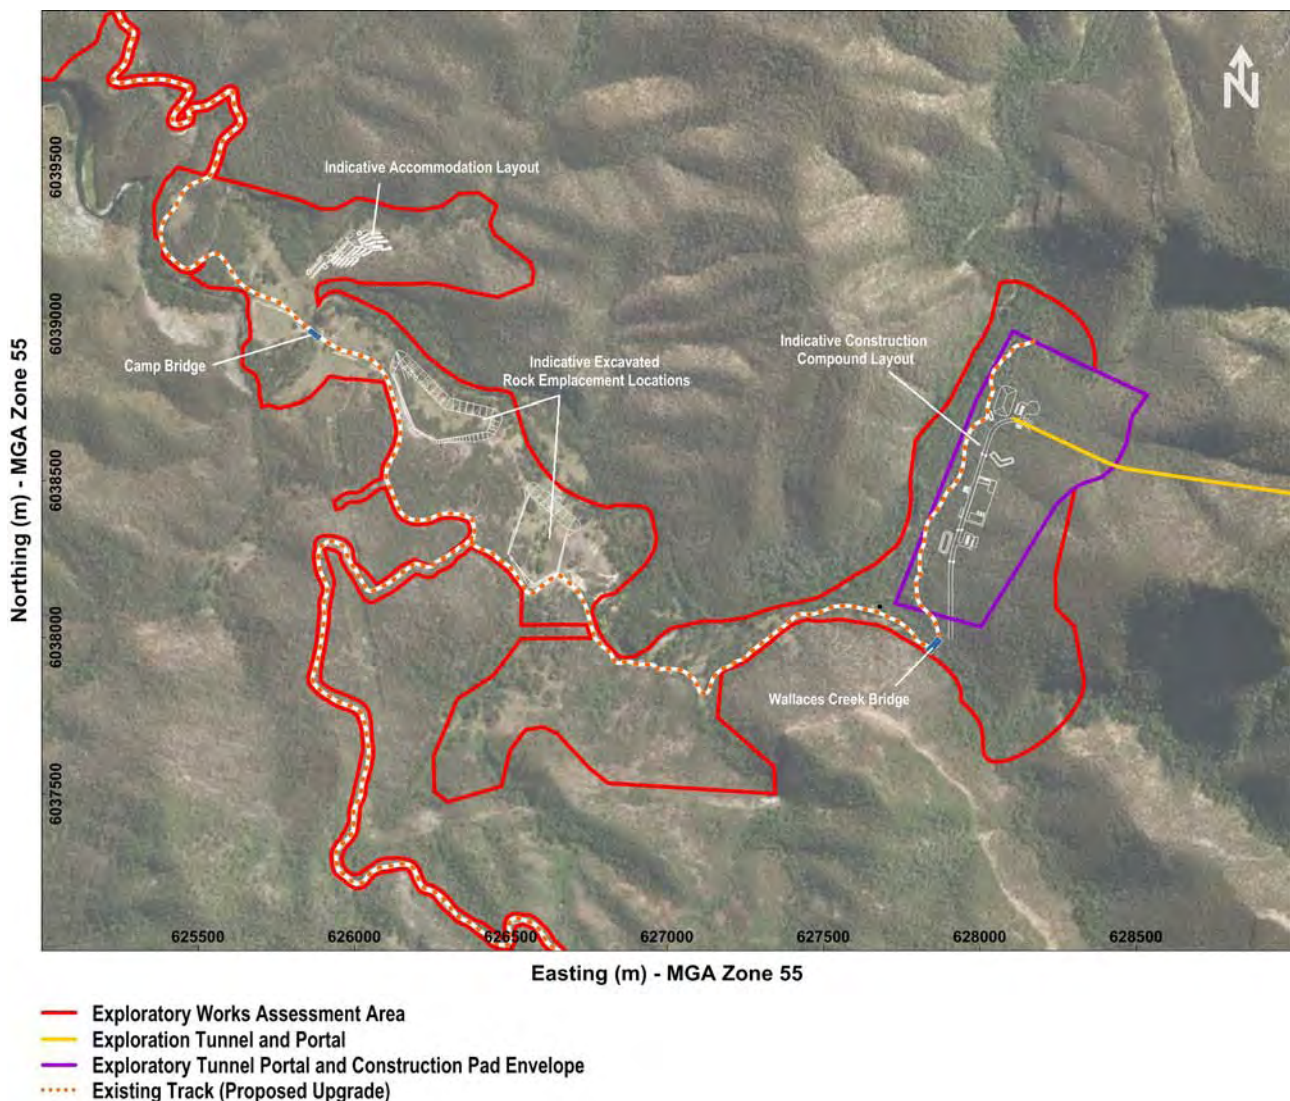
Conceptual layout of emplacement areas, camp, tunnel, portal and portal construction pad for Exploratory Works
